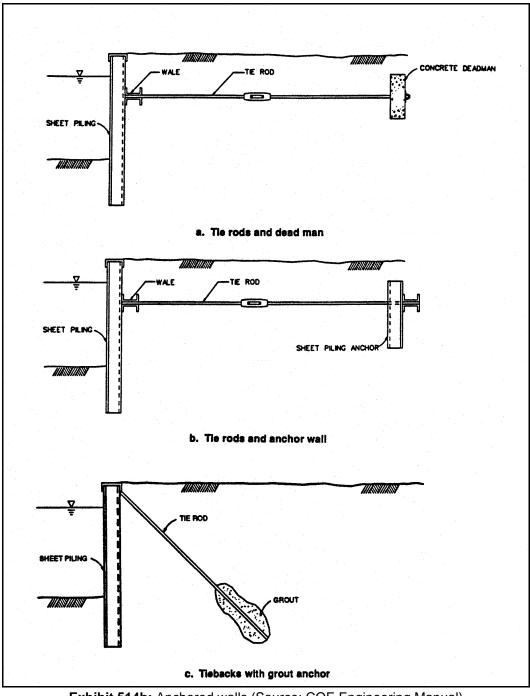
Anchored walls (Source: COE Engineering Manual)
